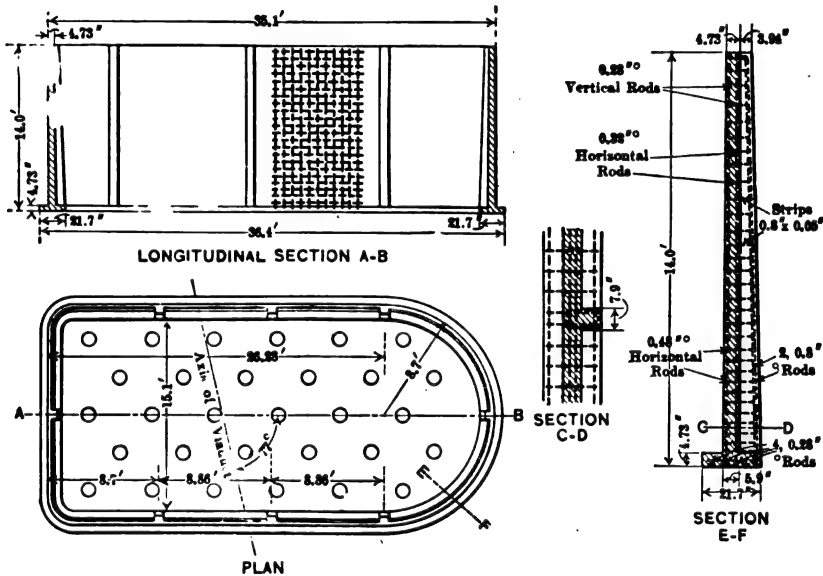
REINFORCED CONCRETE PIER FORMS. BRIDGE OVER THE SEINE, AT ASNIERES.
